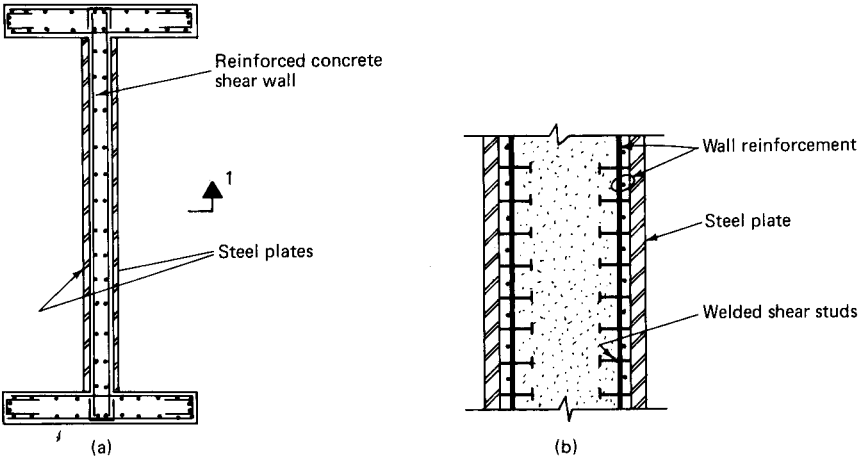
Composite shear wall with steel plates. (a) Plan; (b) section 2.
